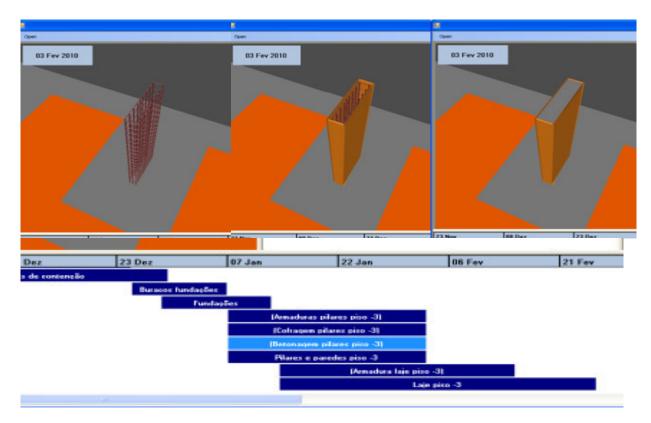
Column construction progress: reinforcement, formwork and concreting.
